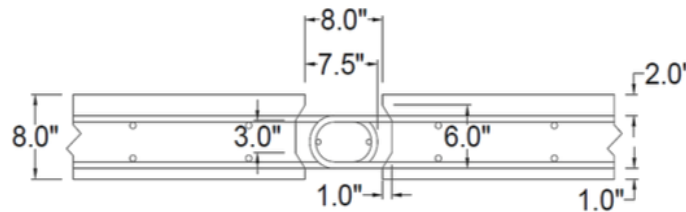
Longitudinal Reinforcement Detail Utilizing Hooped Bars (French, et al., 2011)
